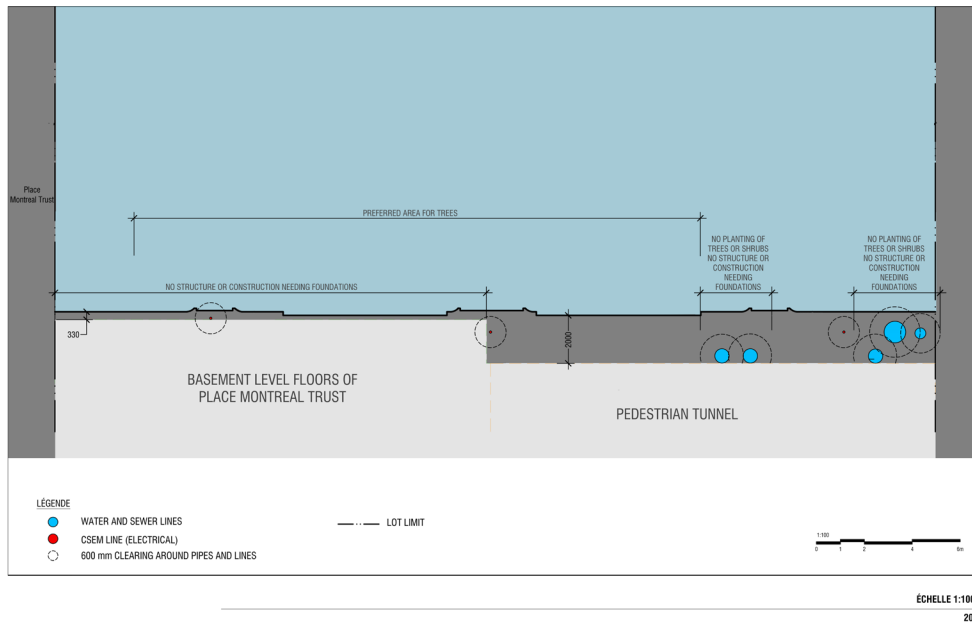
Cross-section of Avenue McGill College indicating the location of underground structures.
